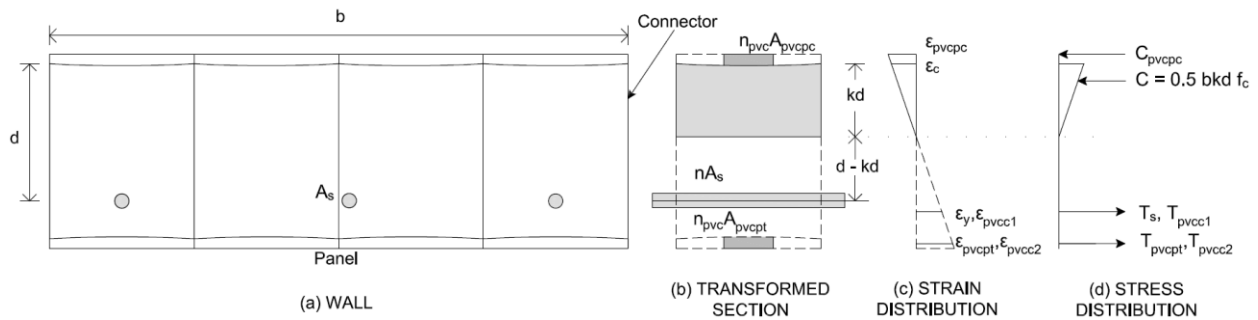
Section analysis of PVC encased concrete walls at yield load.
